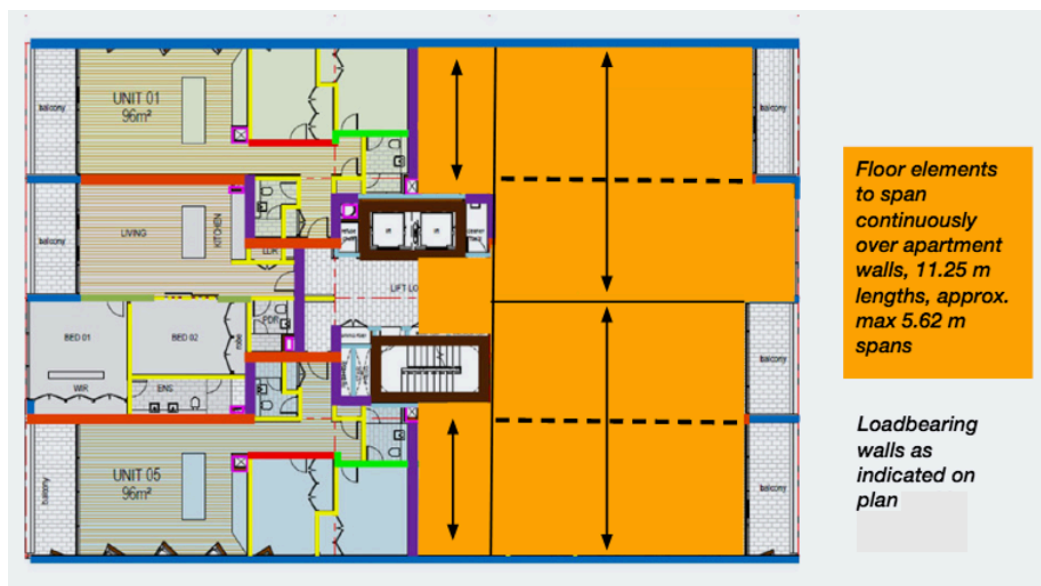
Example of a cellular design floor and wall layout (Woodard and Jones, 2019)
